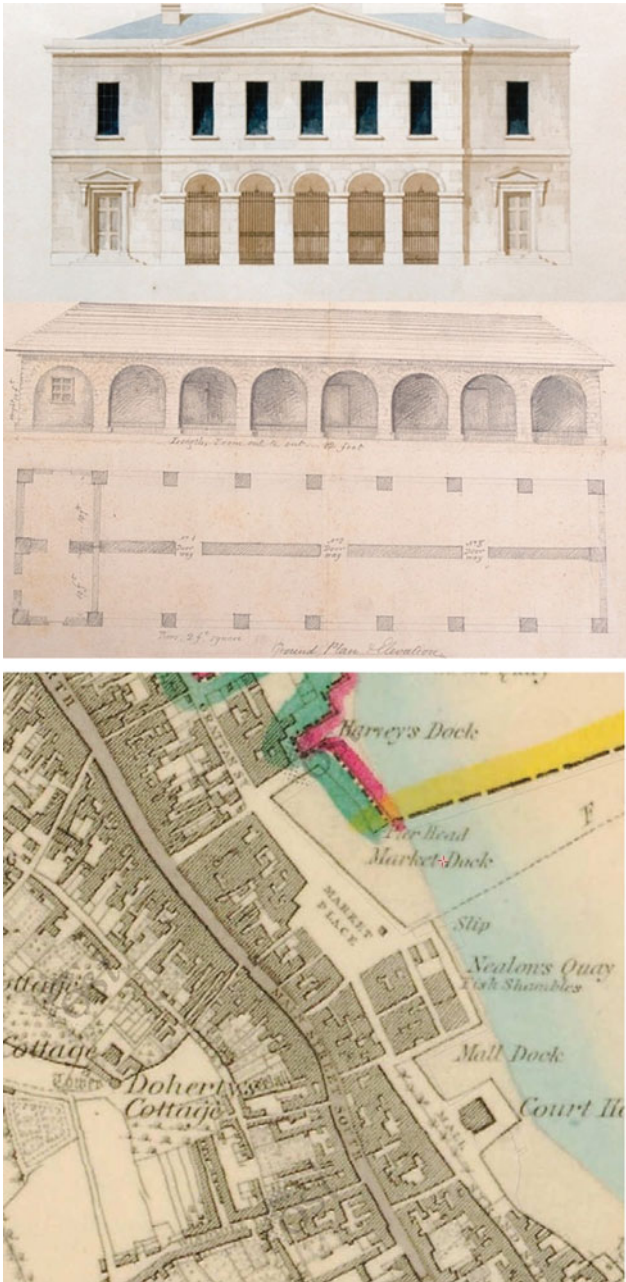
(Colour online) Plans for Youghal market house and proposed site of construction, c. 1834
